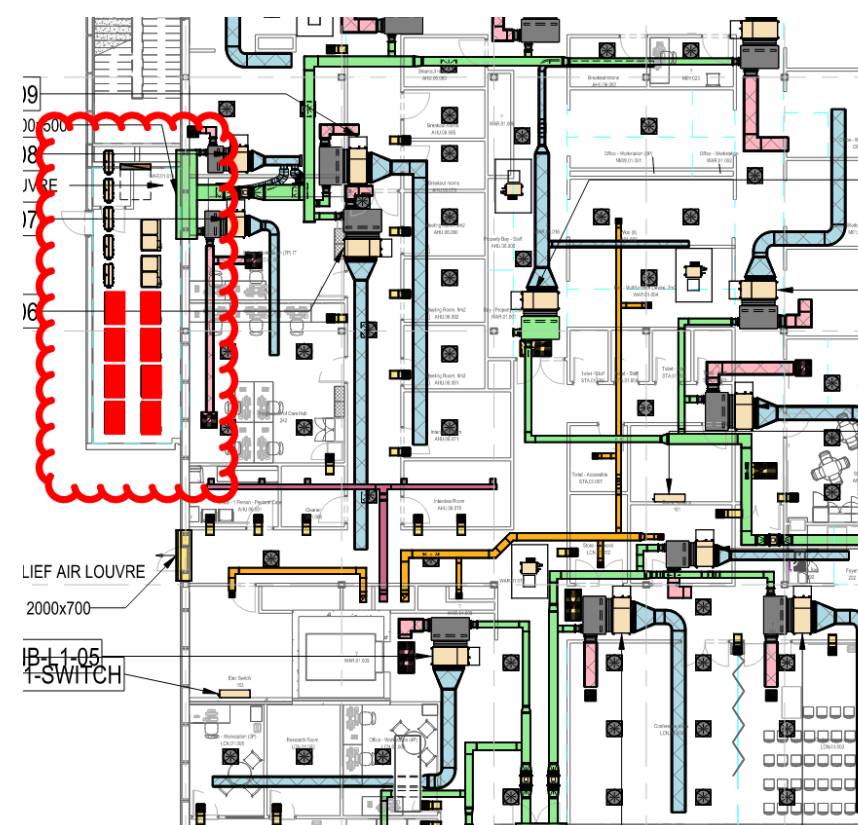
Proposed mechanical plant equipment location – L1 North-East Bldg.
